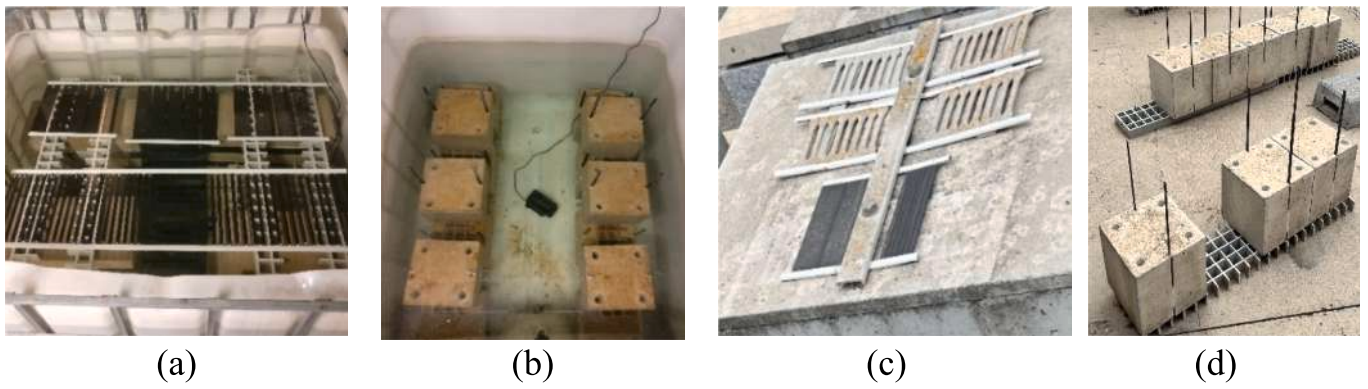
Typical examples of studied environments: (a) exposure of the constituent materials specimens to water immersion (concrete, epoxy adhesive and CFRP laminate); (b) exposure of the specimens of NSM CFRP-to-concrete bond to water immersion (E2); exposure of (c) constituent materials and (d) NSM CFRP-to-concrete bond specimens to natural outdoor environments (E5).
